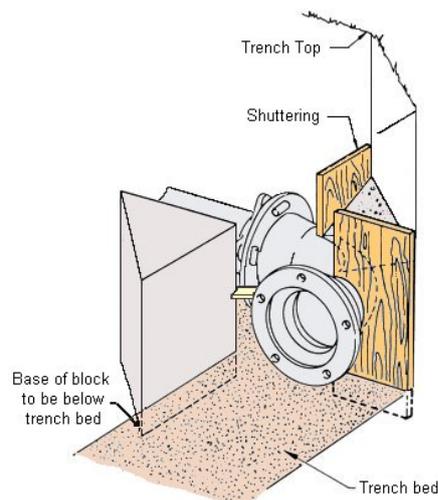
Shuttering for Concrete in Contact with Pipework or Fitting
